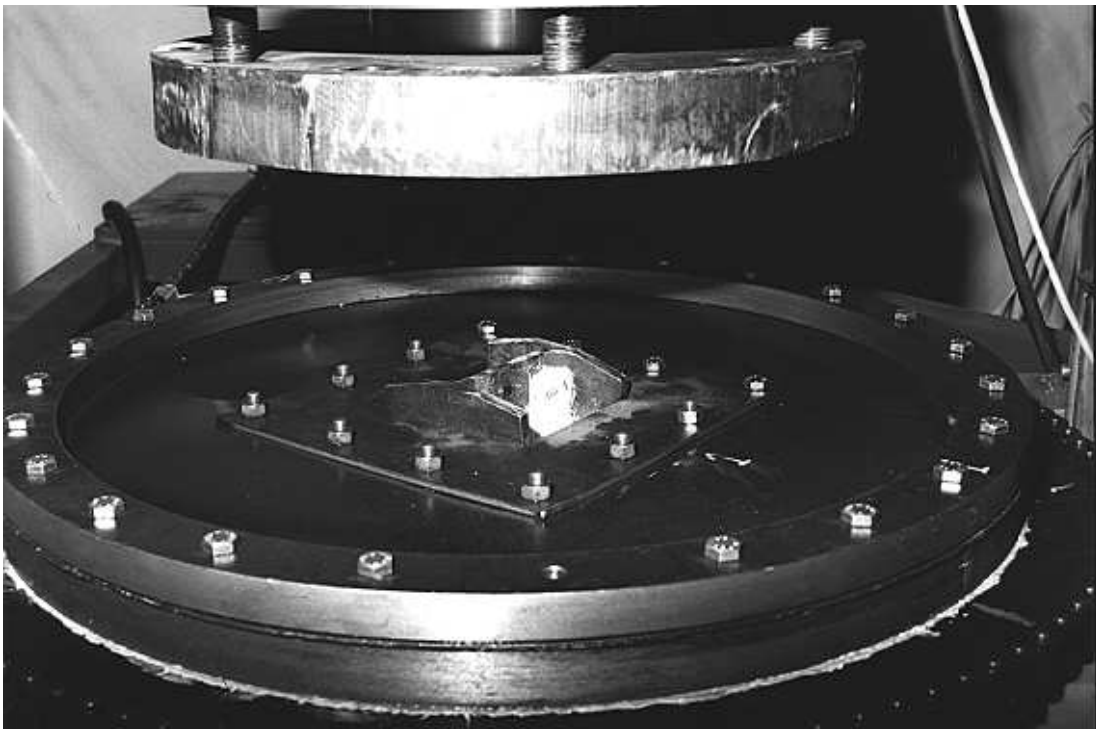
End supports of test specimen, with circular and quadratic end fixture plate.
